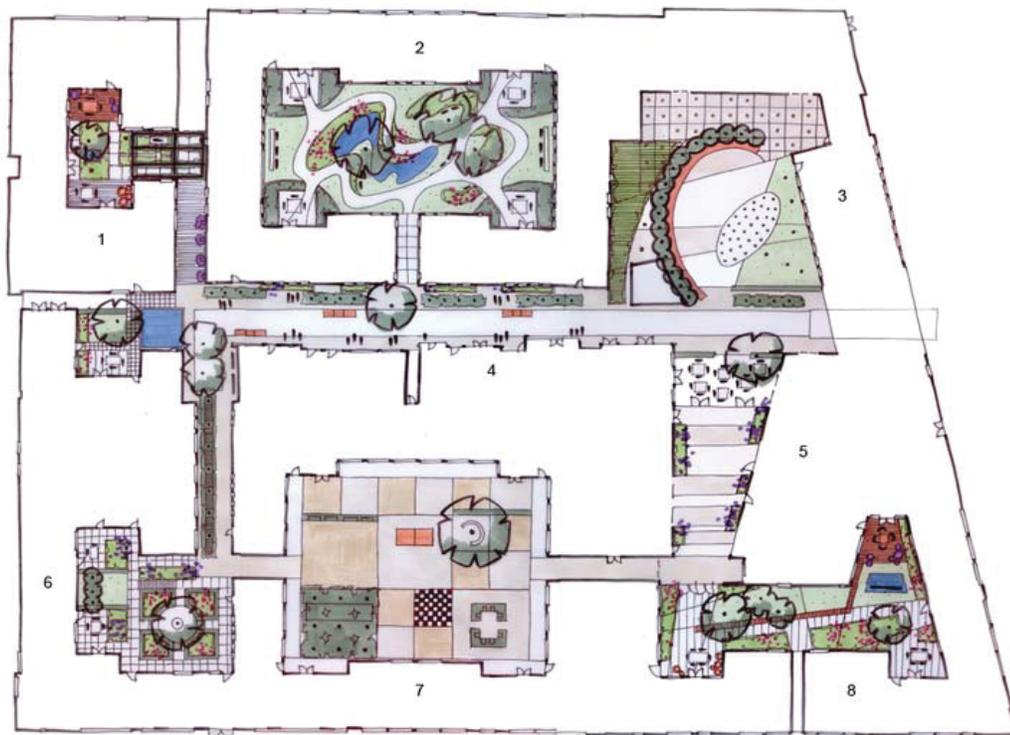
Hogeweyk Dementia Village: site plan and public space
